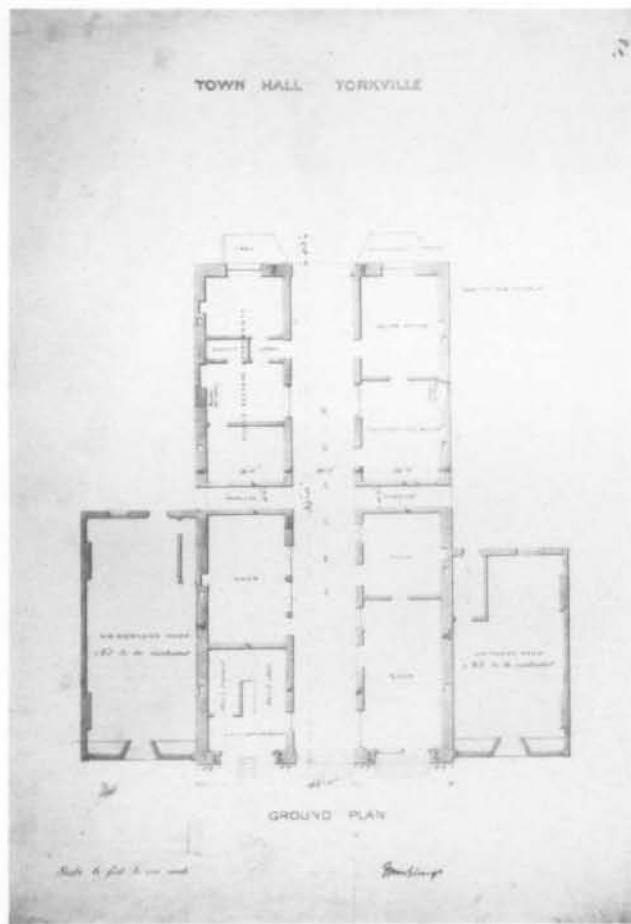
Plan for the Yorkville Town Hall, ground plan. (Photo: Langley Coll., Metropolitan Toronto Library Board)
